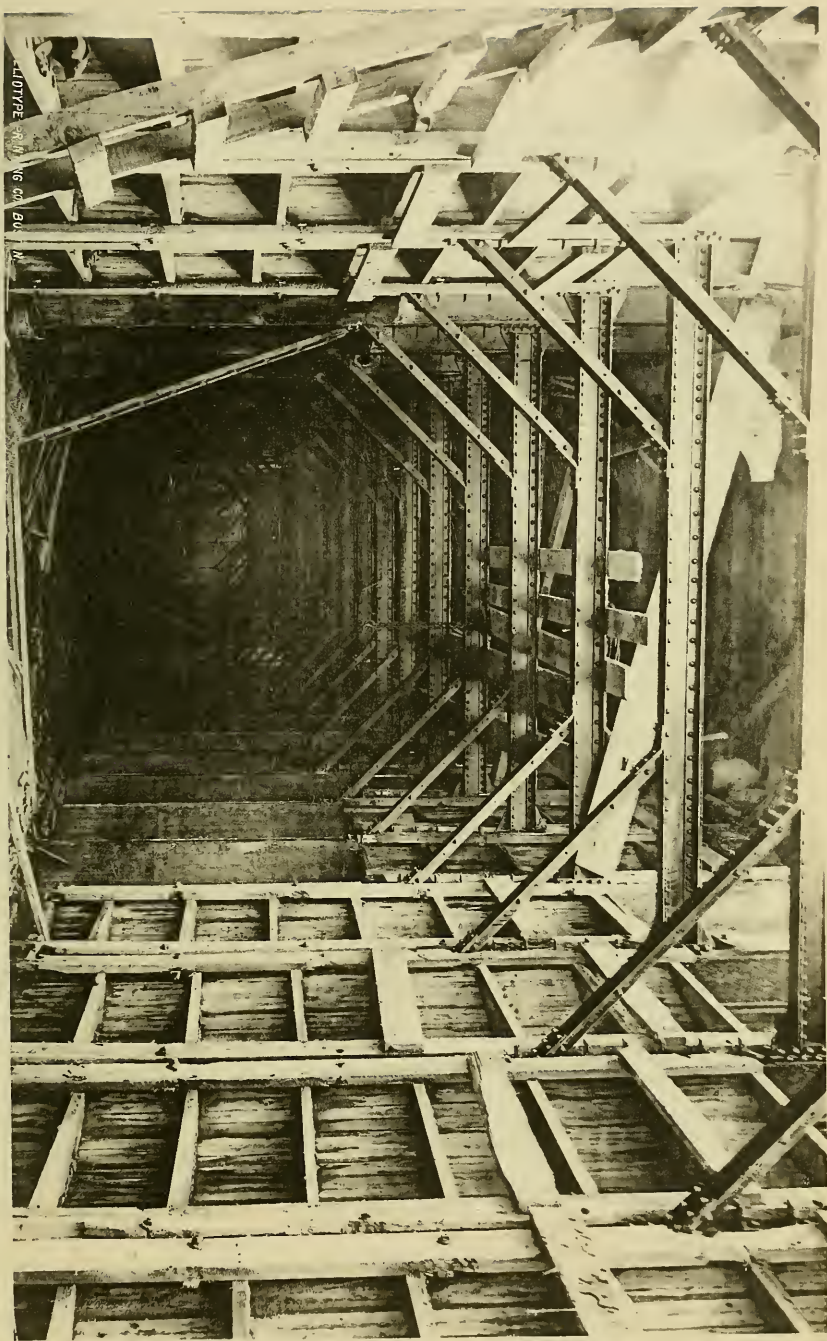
SECTION 2, BOSTON COMMON. MACHINERY AND METHOD OF BRACING
